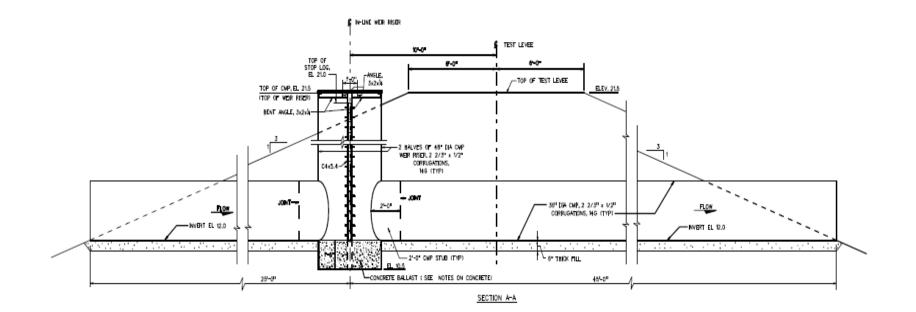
Cross Section of PSTA Cell In Line Riser
